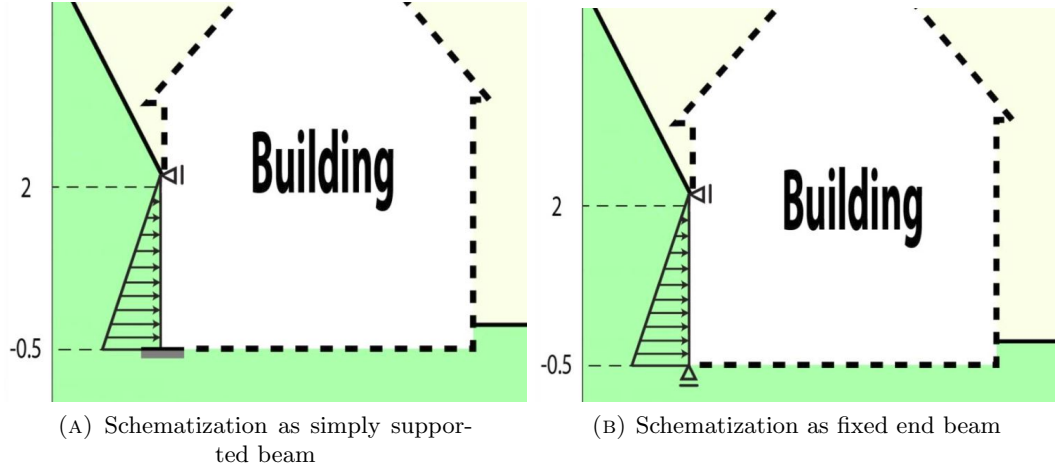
Schematizations of soil retaining wall of the building (vertical and horizontal scale are not the same)
